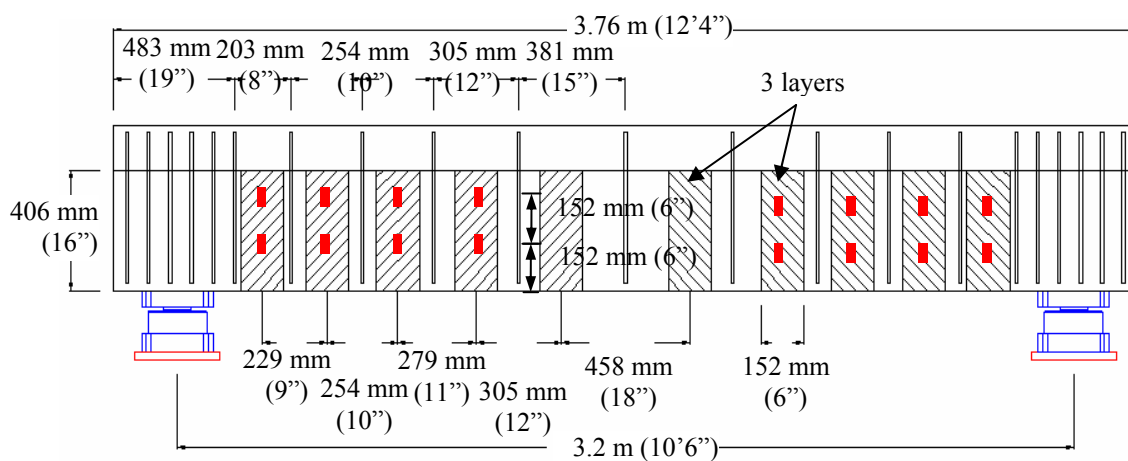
Locations of gages on composite stirrup after girder strengthening
